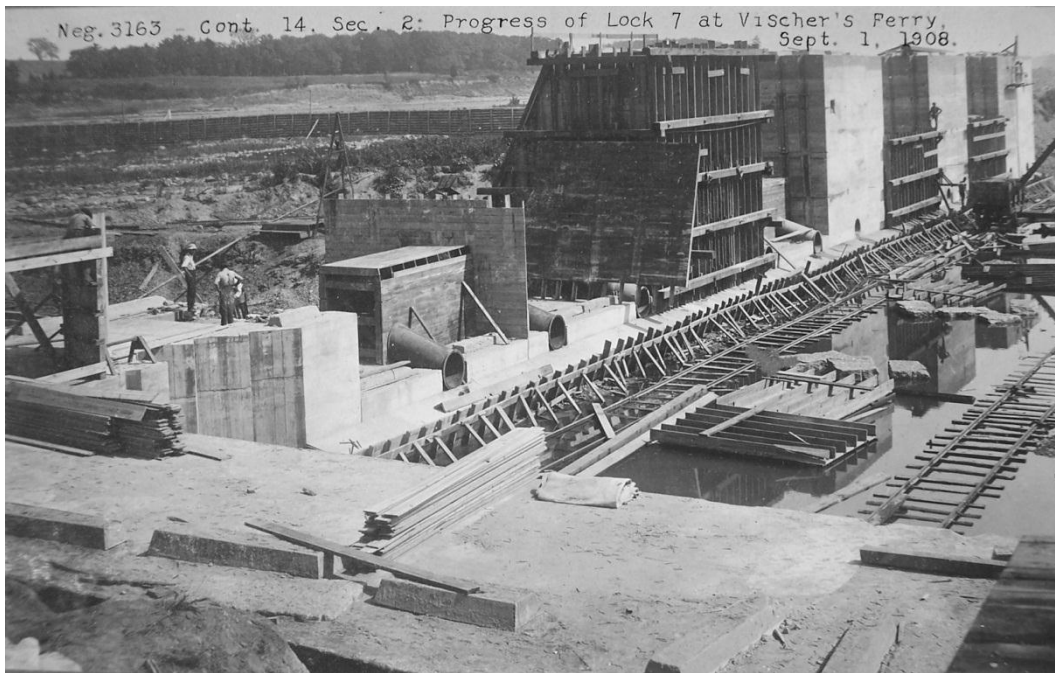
Erie Canal, Lock E7, Niskayuna, Schenectady County – north lock wall segments cast around filling tubes, September 1, 1908 (Contract 11)
